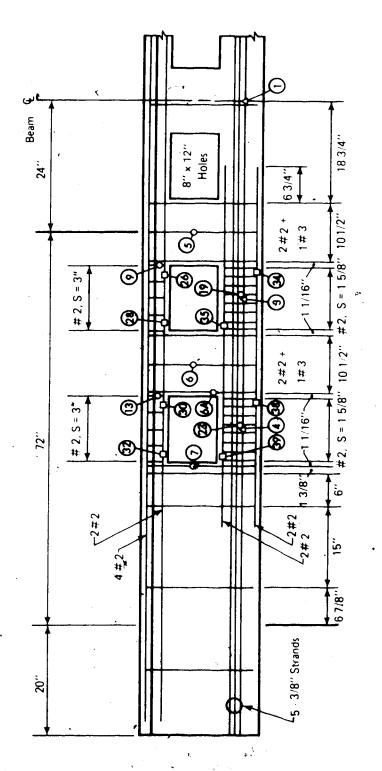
Reinforcement Details and Strain Gage Locations for Beam 29-12-6
